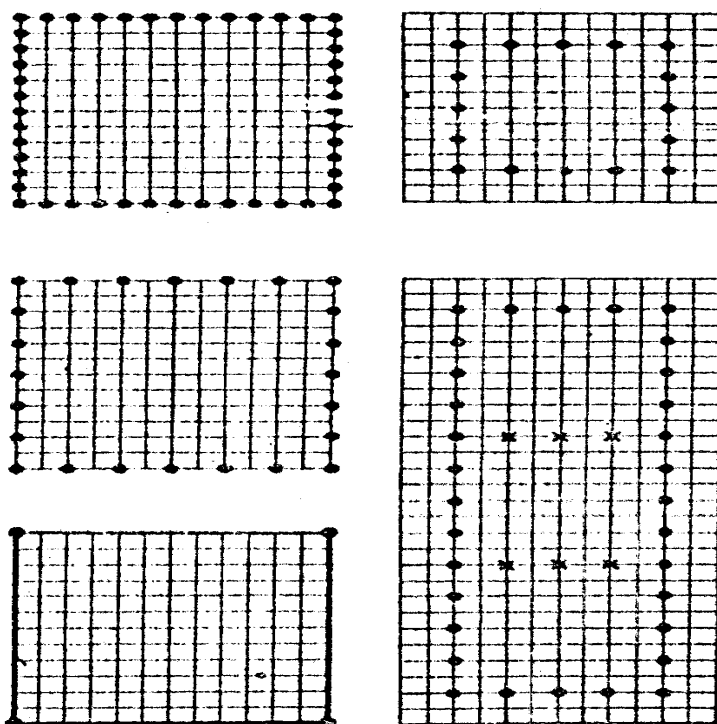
Schemes of placement of supports in spatial constructions with a beam:
